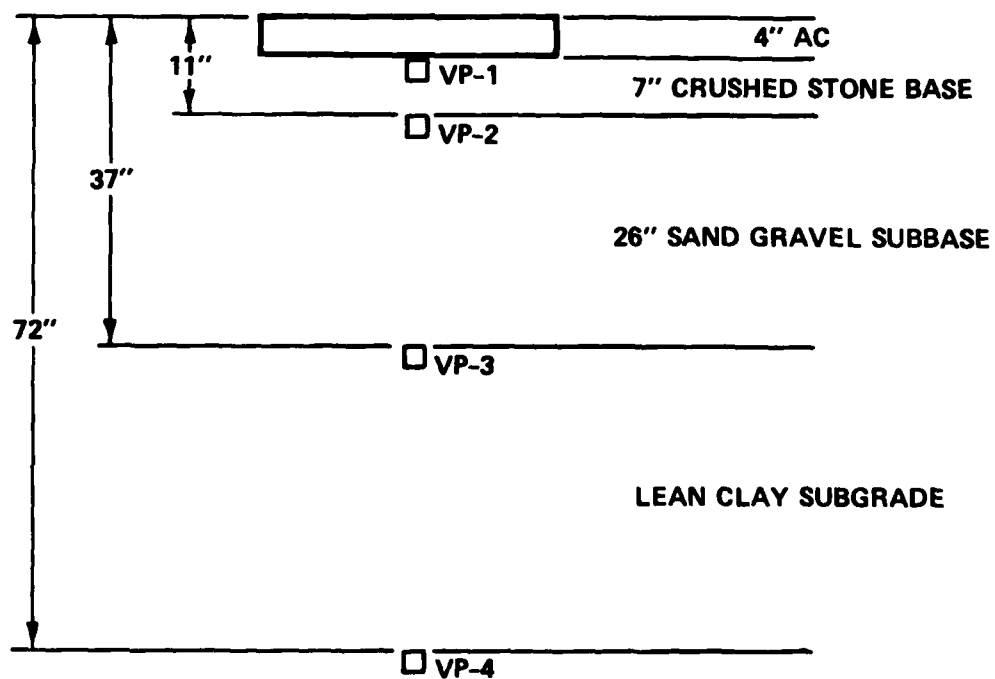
Layout of the AC instrumentation section (1 in. = 2.54 cm)
